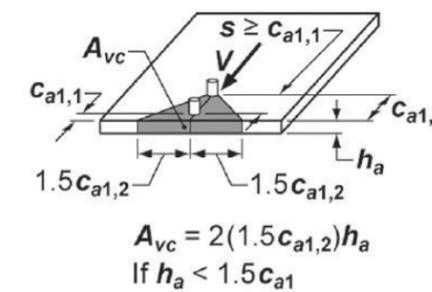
Fig. R17.5.2.1b — Calculation of A_{vc} for single anchors and groups of anchors per ACI 318-14..
